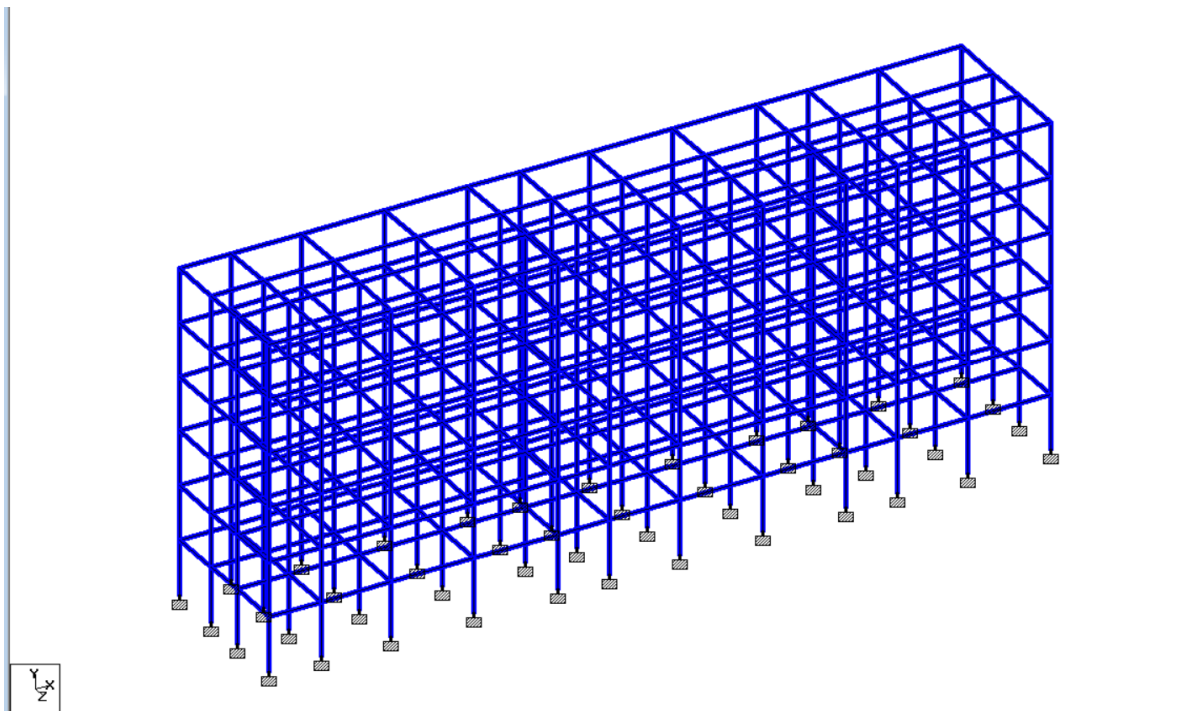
RCC Frame with Beams And Columns in (Staad Pro)
